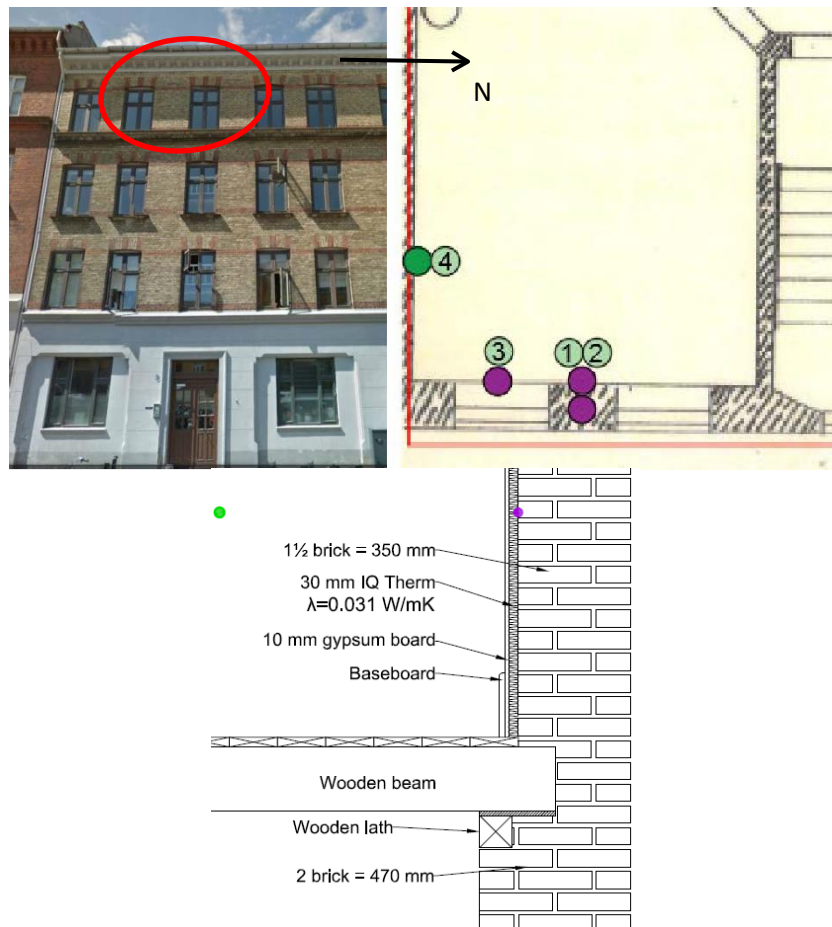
Thomas Laubs Gade and indication of wall placement (left), sensor placement on floor plan (middle) and construction with sensor placement (right)
